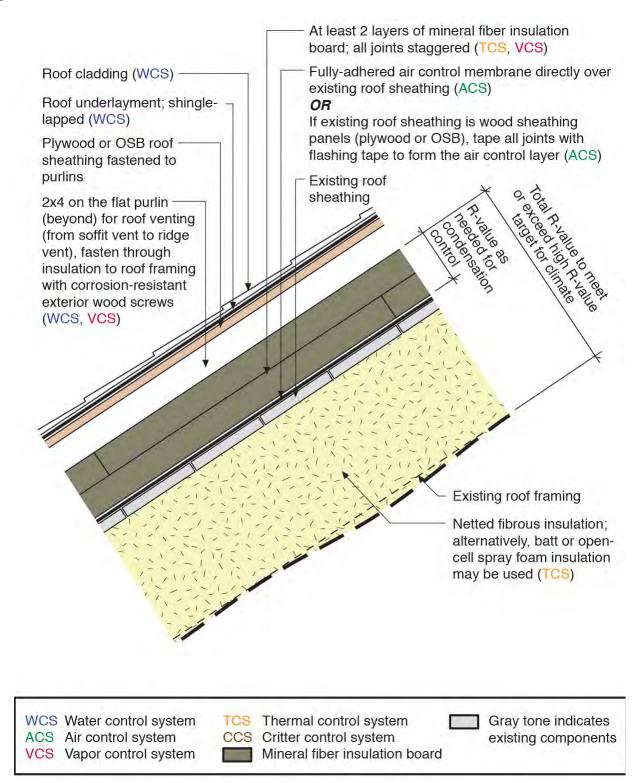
Mineral fiber retrofit roof assembly with a vented roof cladding
